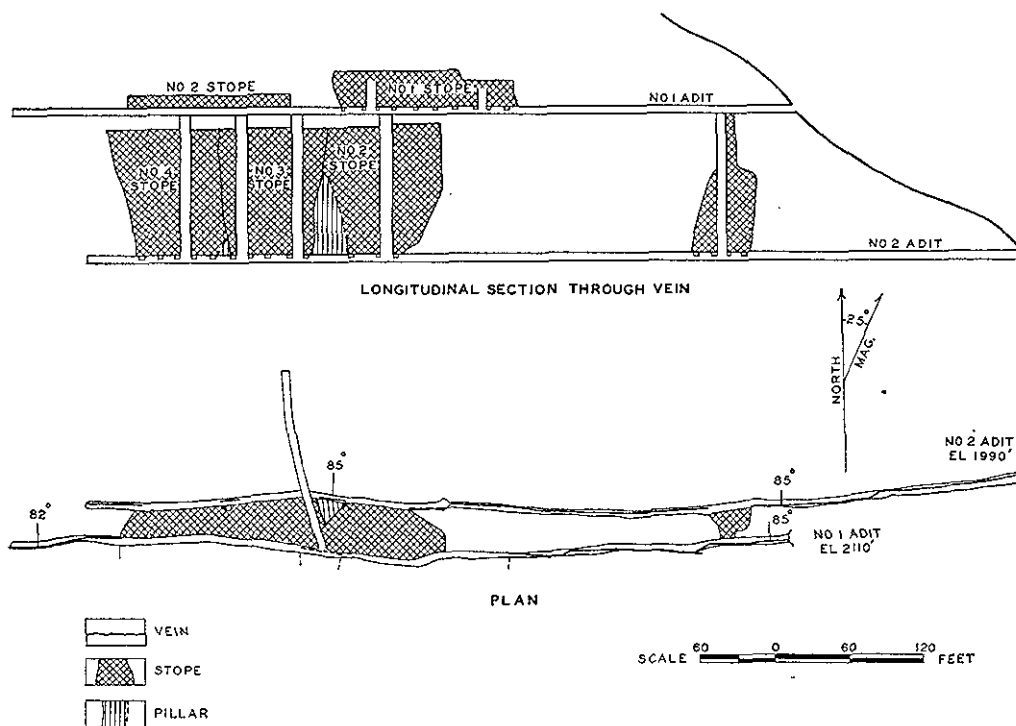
Homeward: Plan of adits and longitudinal section through vein.
